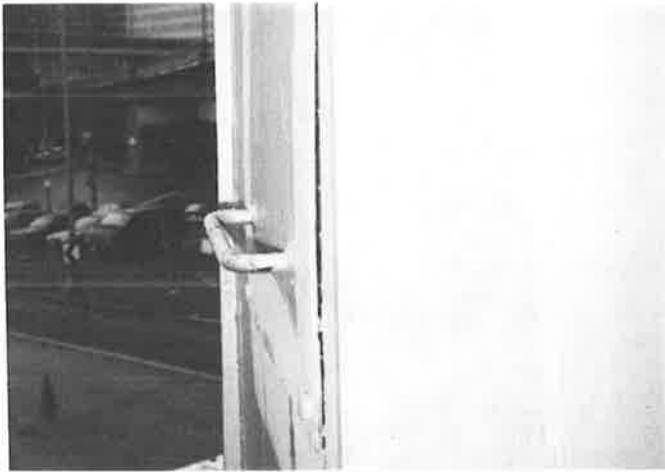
Access Hatch Cover Bowing Due to Corrosion
